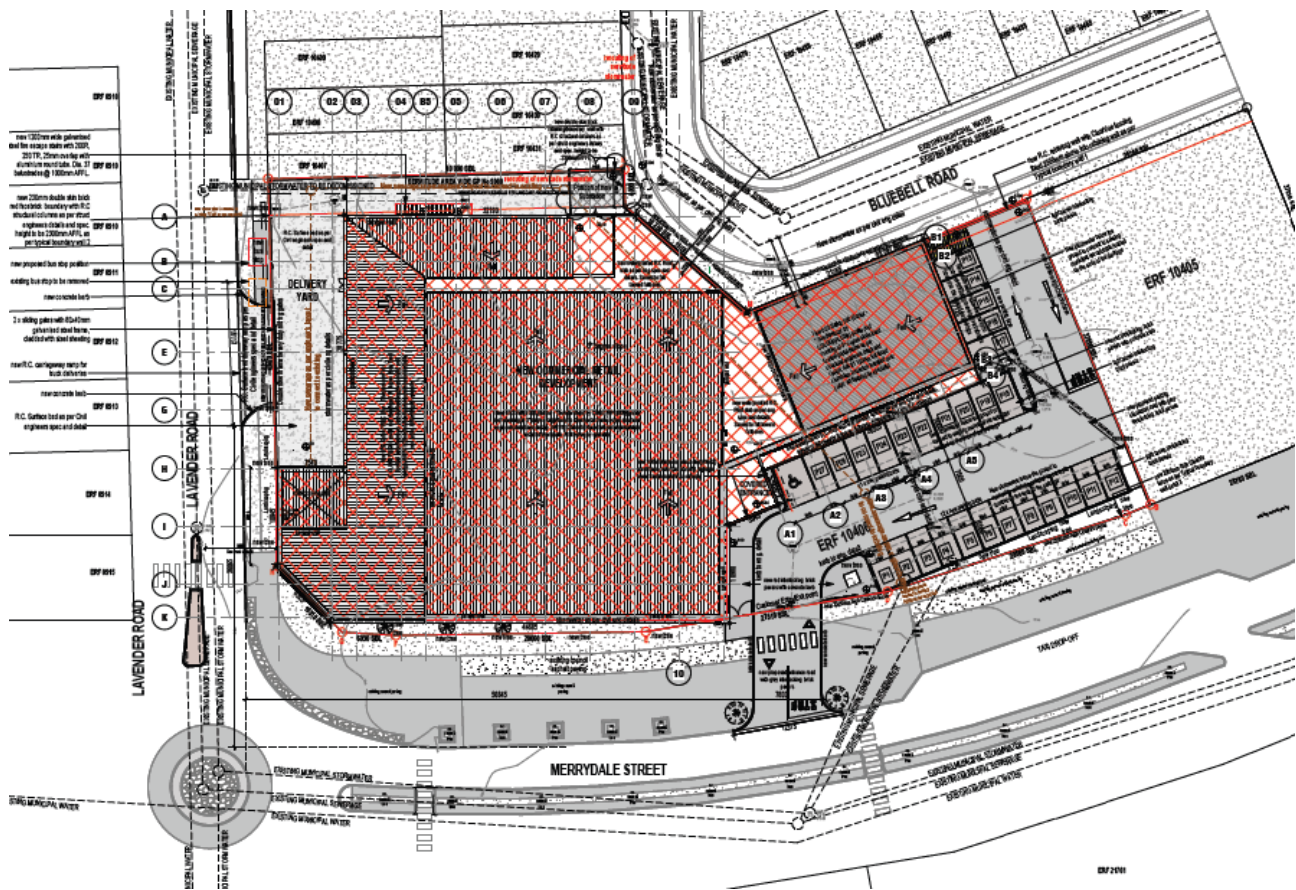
Approved BDM Application Site Plan (Source: MWP Architects)
